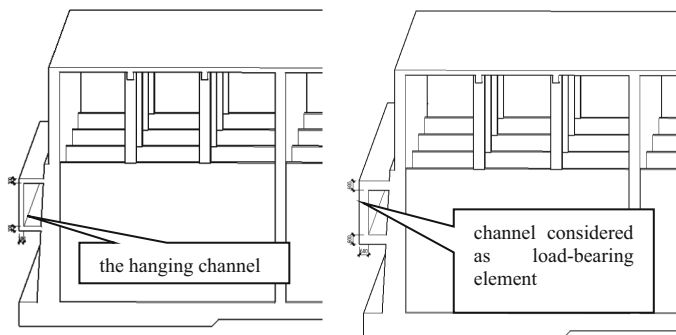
The outside hanging channel of an underground wastewater treatment plant (thin and thick channel).
